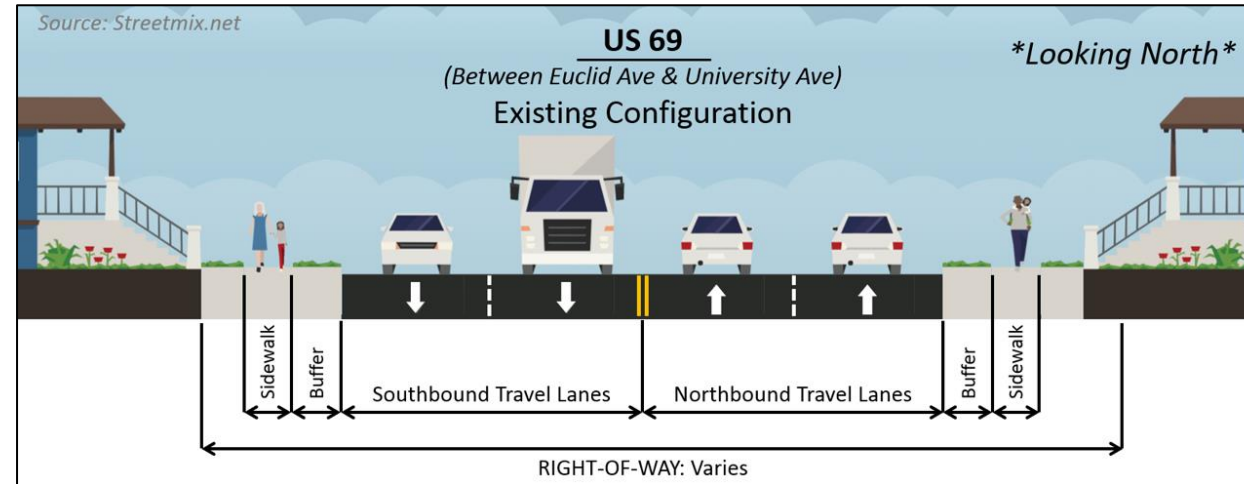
Existing US 69 Typical Section Between Euclid Avenue & University Avenue
